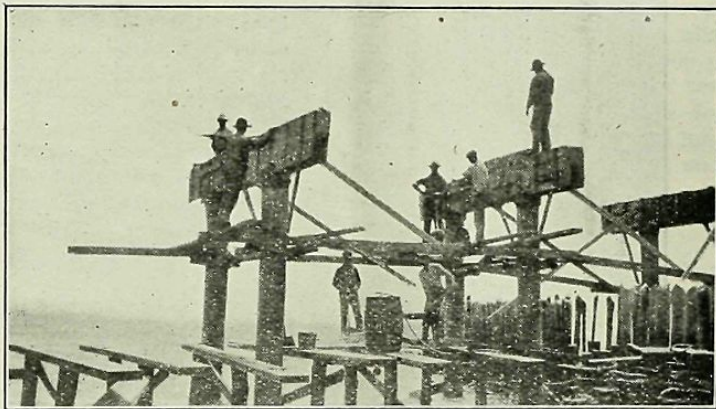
BUILDING GIRDERS ON THE PIERS.
